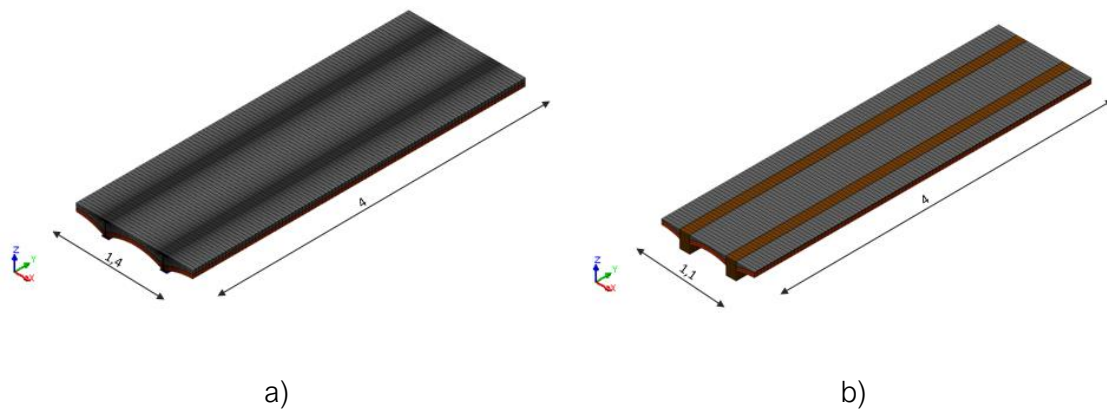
3D solid finite element models of the floor system with tile vaults and: a) steel beams; b) timber beams (dimensions in metres).
